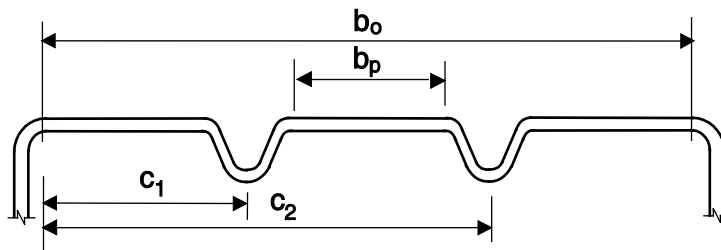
Plate Widths and Stiffener Locations
